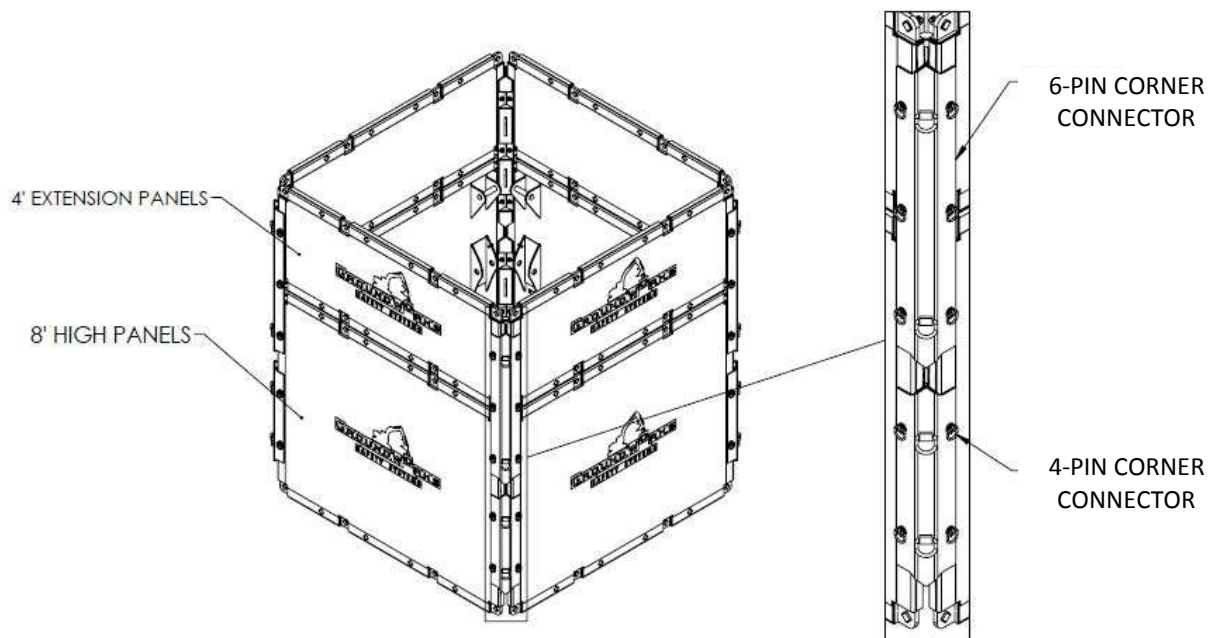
Pit Kit with 8' Panels and 4' Panel Extensions
